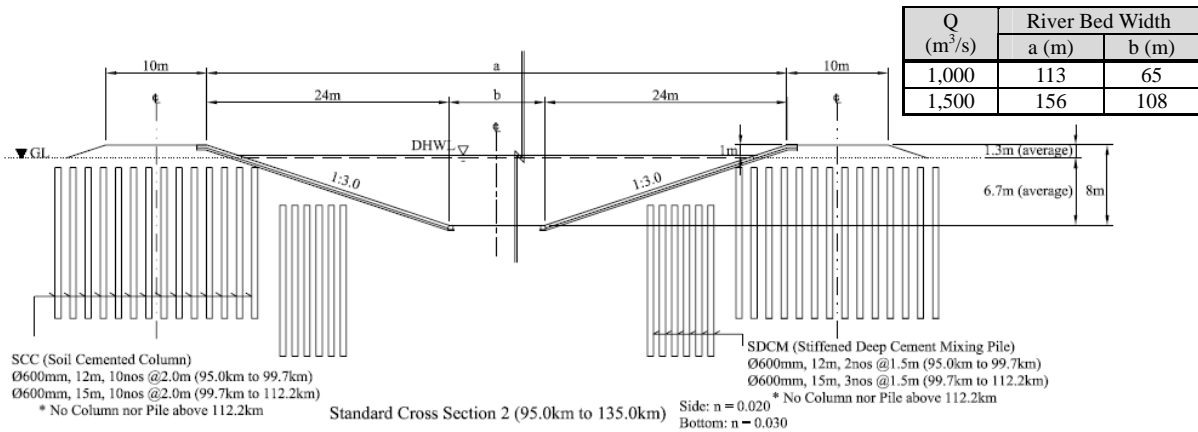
Standard Cross Section of East Diversion Channel with Slope Protection (95km to 135km)
